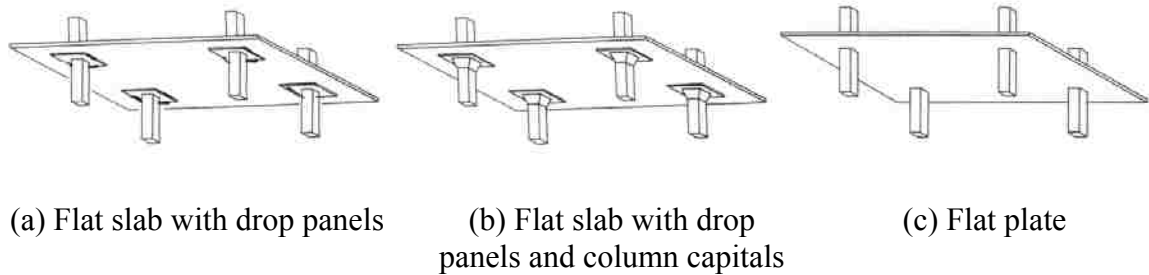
Classification of flat slab construction (Park & Gamble, 2000)
